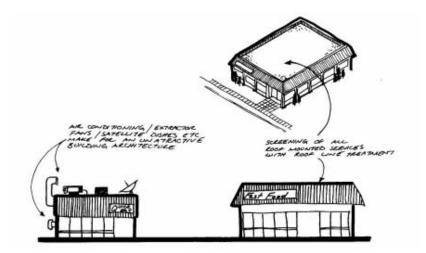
Placement of air conditioning units, extractor fans, satellite dishes, chimney vents and aerials on building roofs does little to enhance the architecture of a building by breaking up roof lines with a mixture of awkward shapes, sizes, textures and colours seen seemingly as add-ons.
